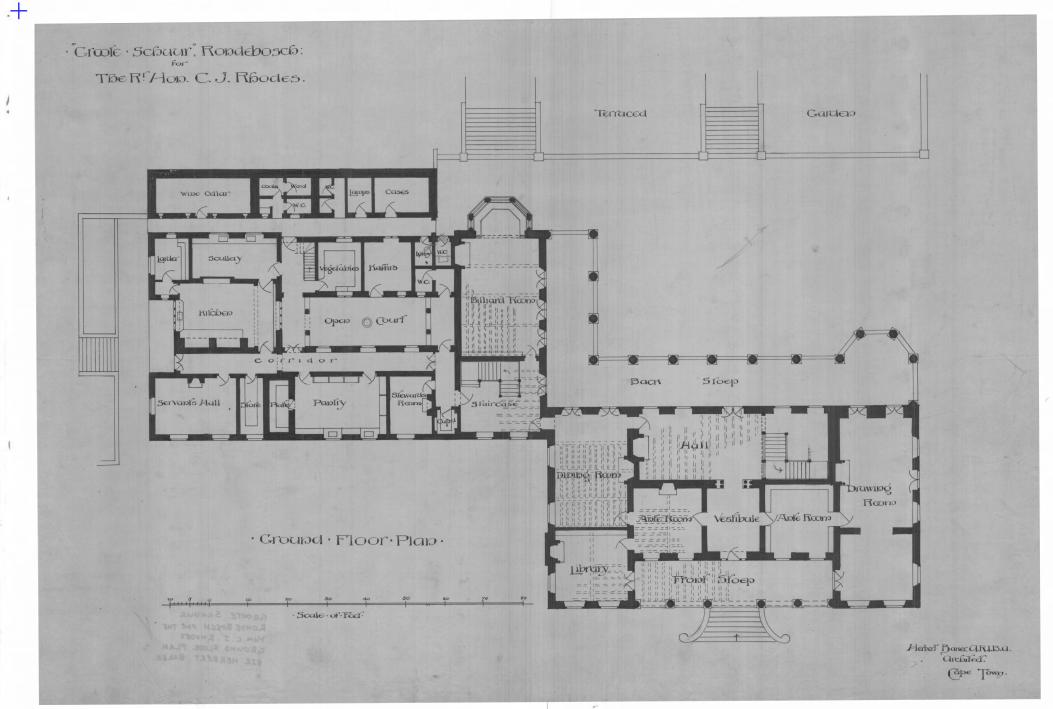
Sir Herbert Baker's proposed ground floor plan for Groote Schuur (1896)
